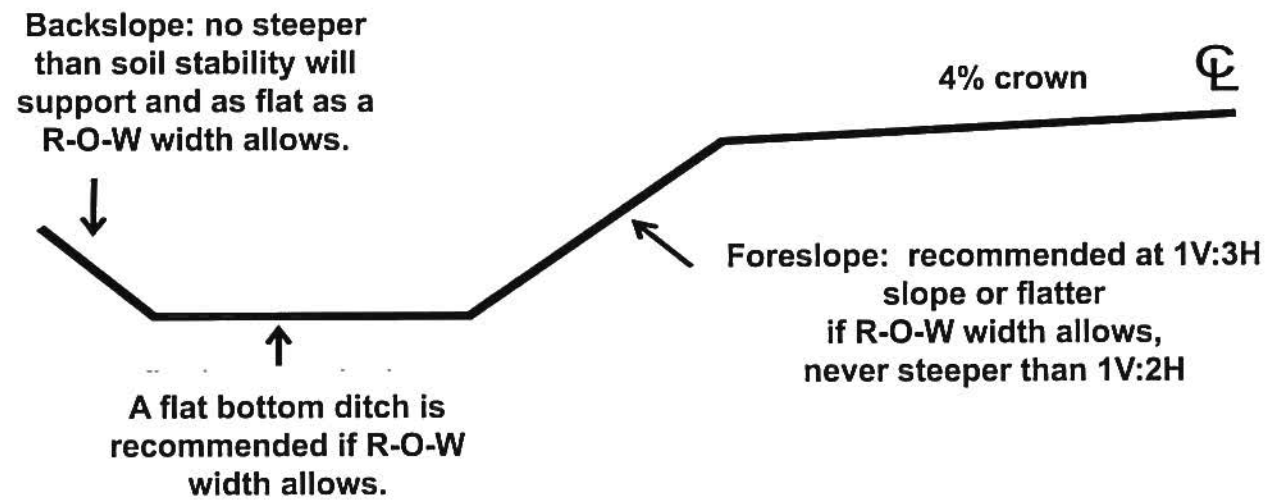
A basic example of what the profile of a reshaped gravel road should look like.
